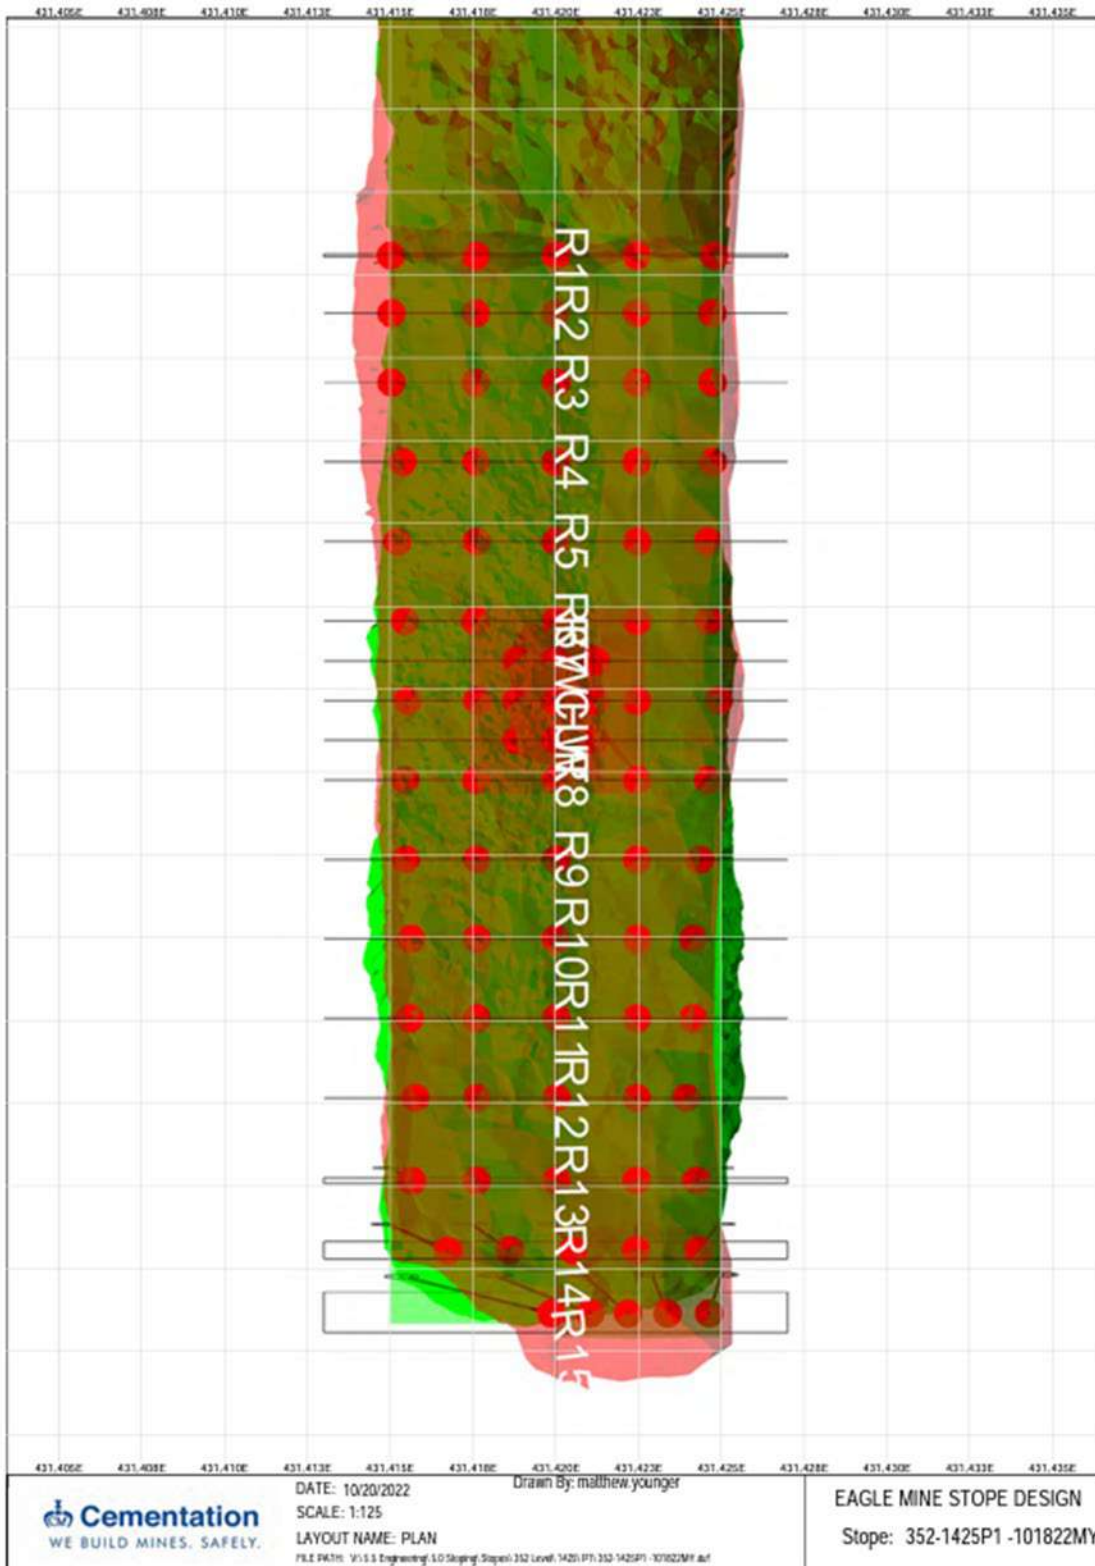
Typical Longhole Drilling Layout in a TSLOS Stope – Plan View
